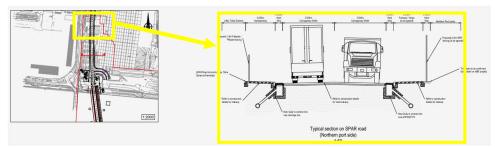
Excerpt from the applicant drawings showing no cycle lanes on the road to the north of the SPAR bridge (Source: Dwg. No. CP1901_3FM-RPS_S26-GEN-XX-DR-HE-100-0001)
